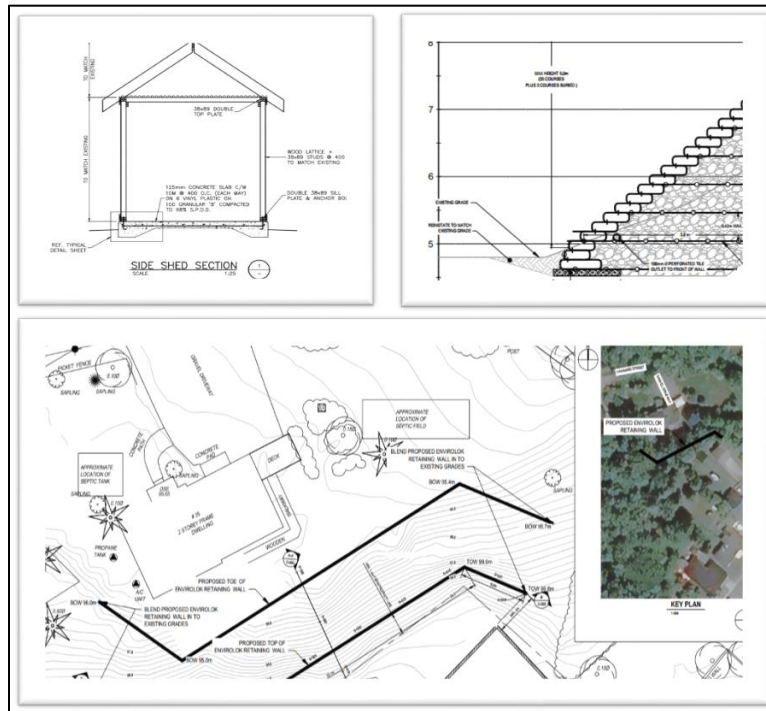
Example of the design package with retaining wall for 35 Hayward Street, Port Hope
